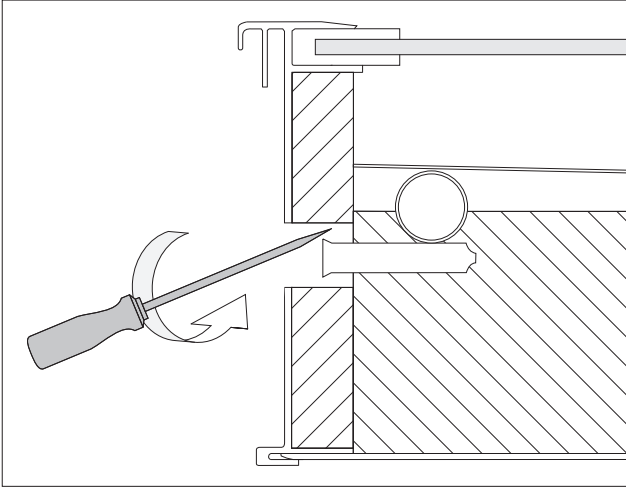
Remove rubber plug from frame. Possibly use screwdriver to lay open sensor sleeve.
